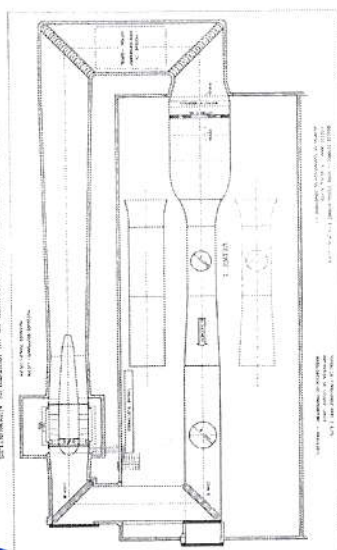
Wind tunnel general drawing / Plan d'ensemble de la soufflerie
